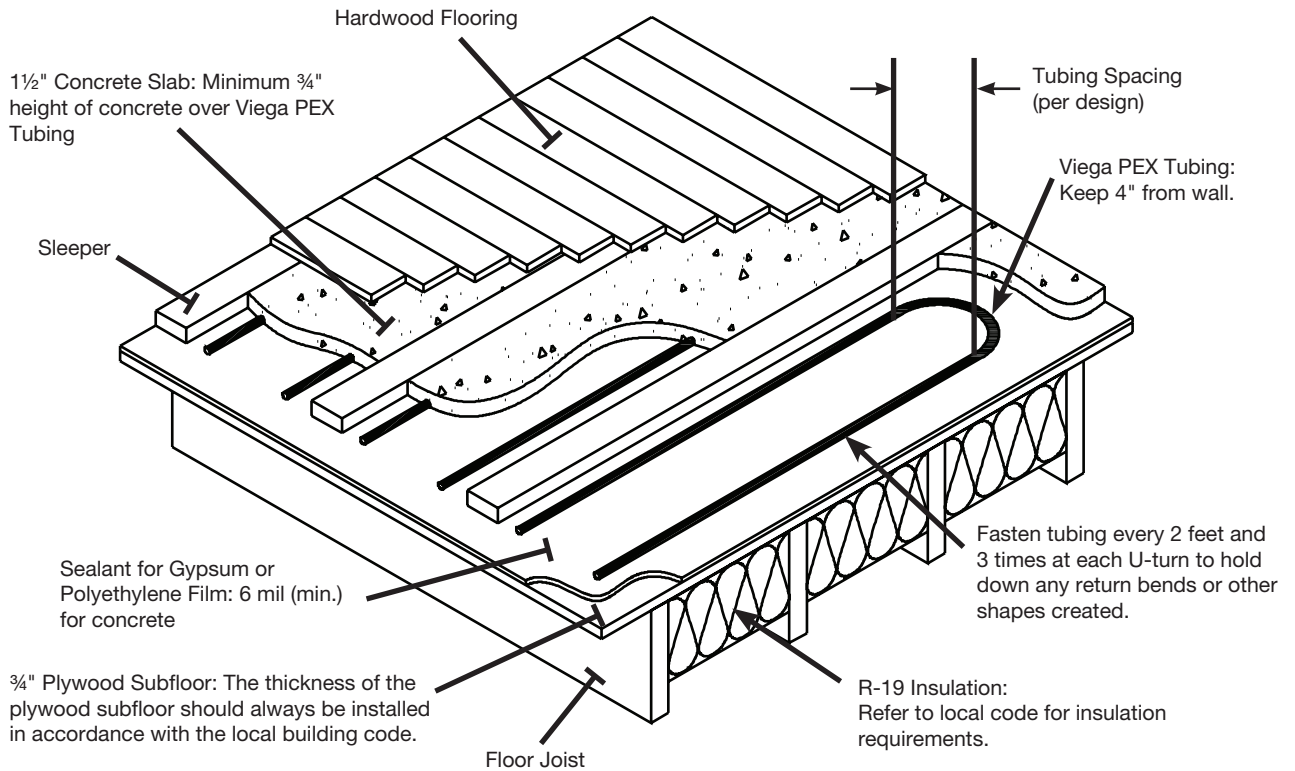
Hardwood floor over thin-slab and wood subfloor with sleepers
